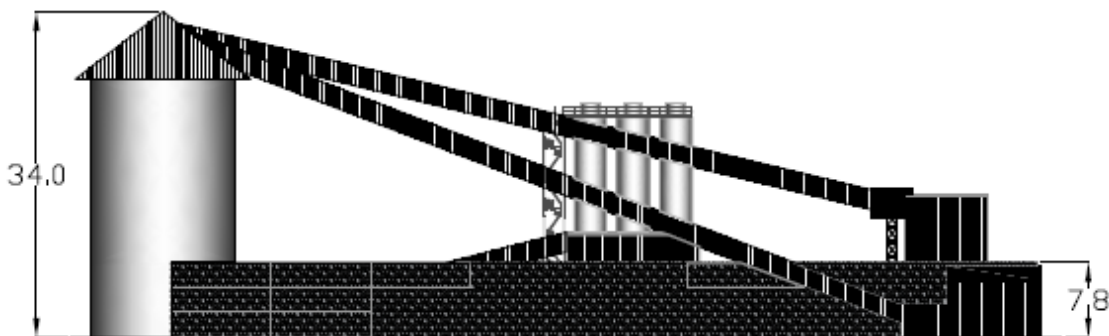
East elevation of the proposed development showing the approximate height of the building.
